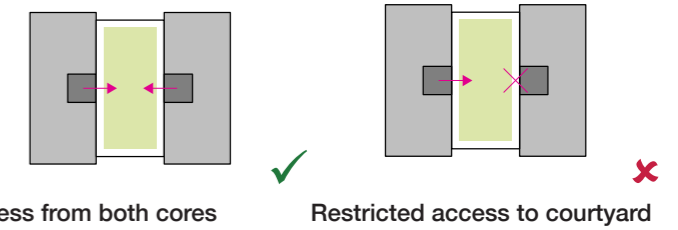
Plan diagrams: Cores and access to courtyard spaces.
